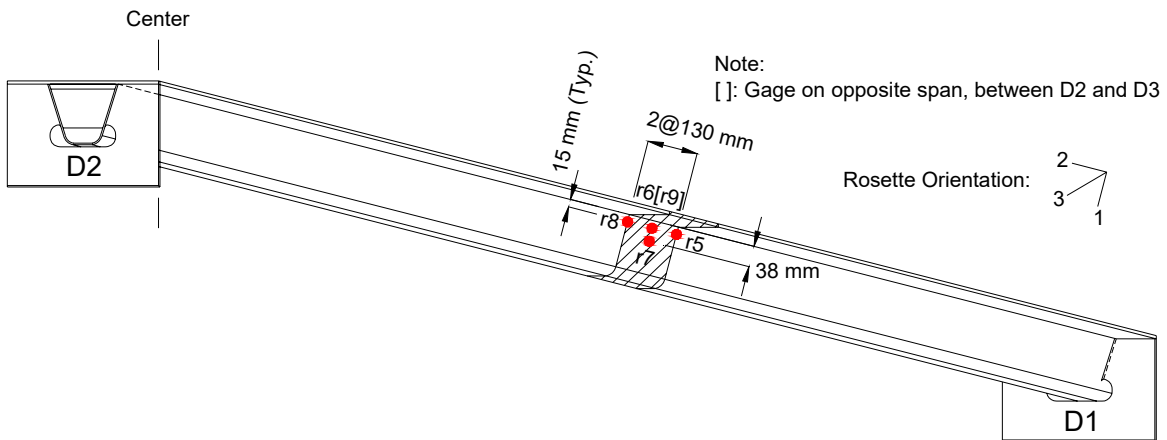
Specimen 4: Strain Gages in Outer Surface of Rib R3 near Rib-to-Deck Welds
